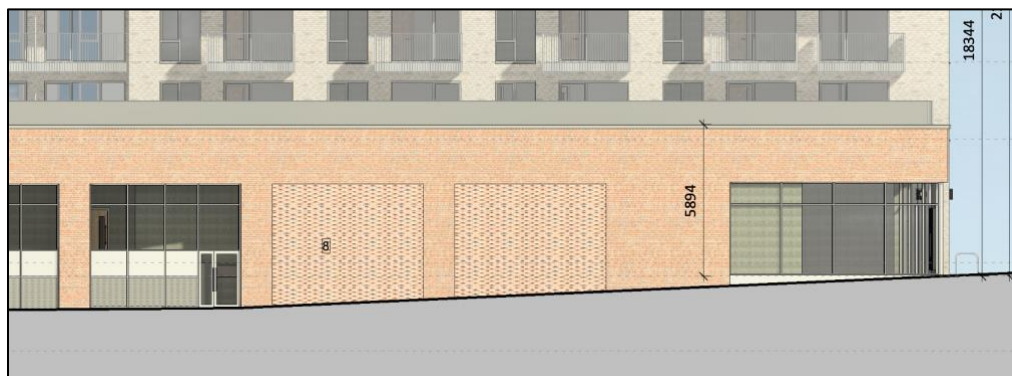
Extract from Drawing ‘Block 01 – Elevations – Permitted Drawing No. ‘19016A-OMP-B1-ZZ-DR-A-2001’, prepared by O’Mahony Pike Architects.
